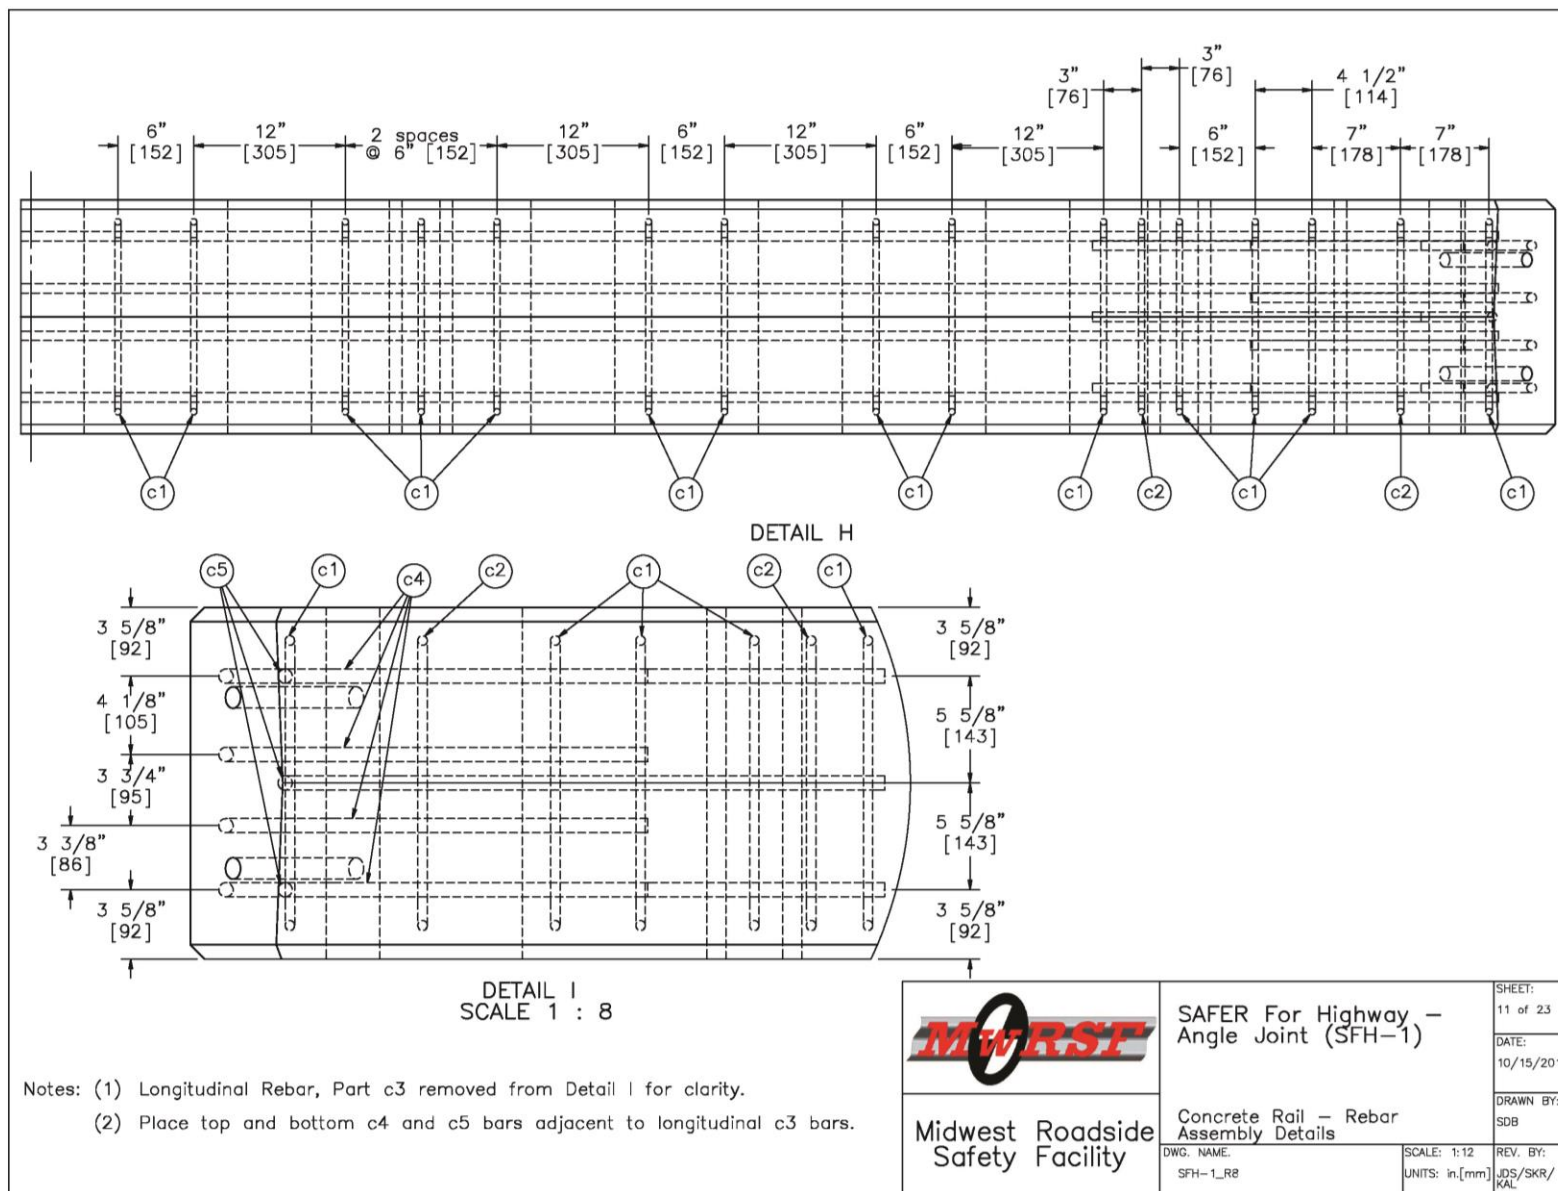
Recommended Barrier Design for Full-Scale Crash Testing, Concrete Rail Details
